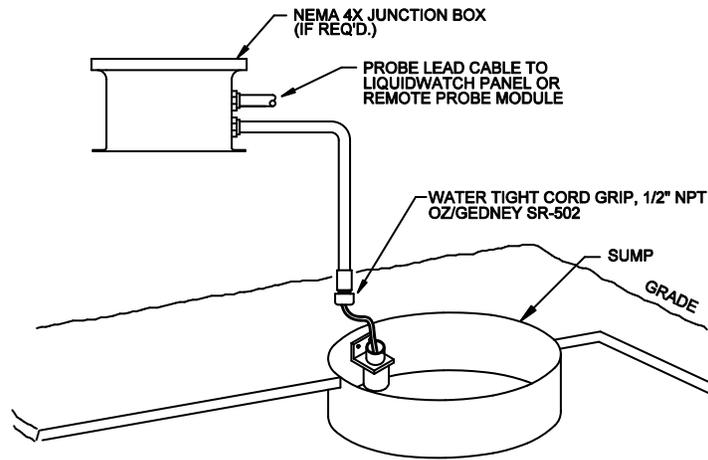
Typical PTHL-LW Float Switch Installation
